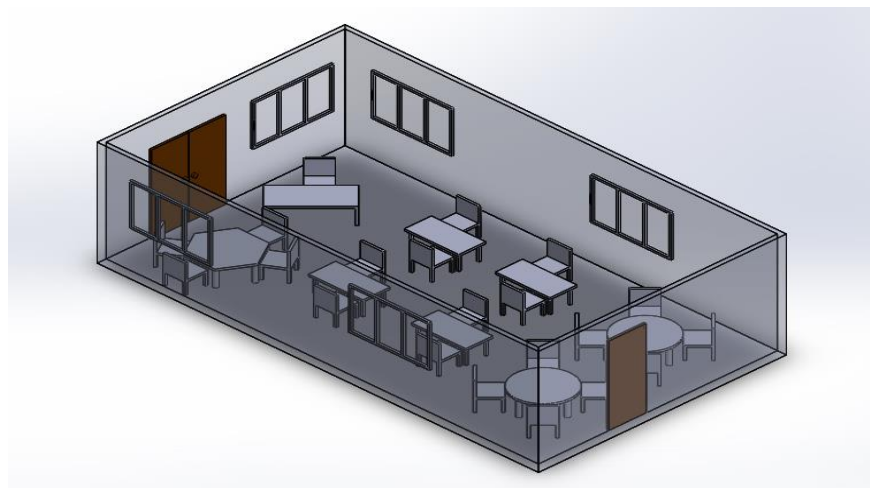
Layout building for Tabika Kemas Kampung Padang B
